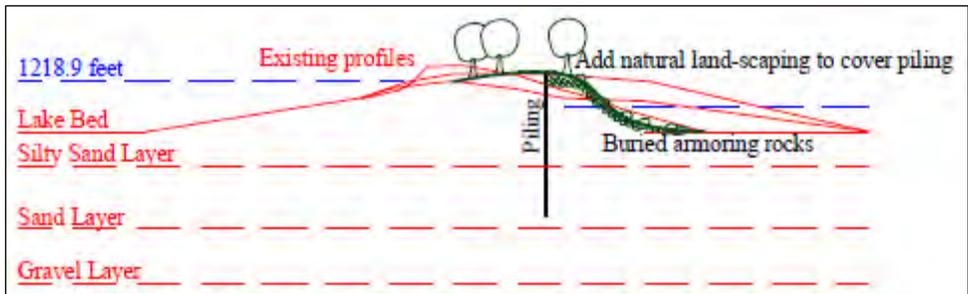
Cross Section of Proposed Sheet Pile Core Wall
